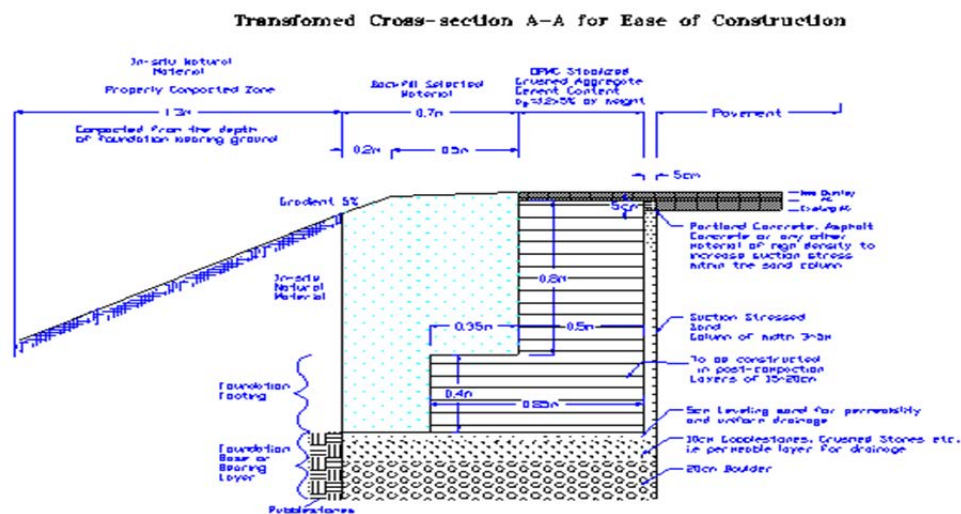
Cross-section A-A showing the foundation, stabilized retaining wall, improved layer configuration and geomaterials and ground improvement stabilization zones
